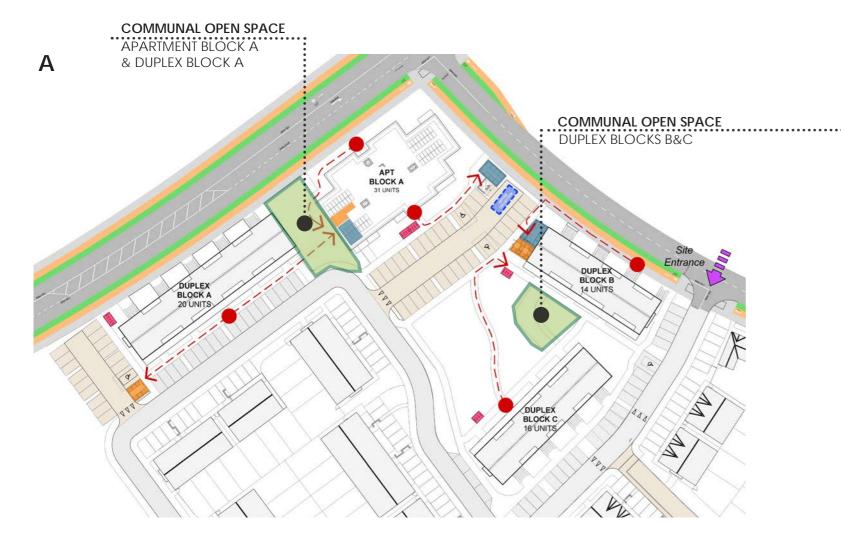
Detail of site layout Stage 2 and Stage 3) enhancement of communal areas and services provided (bins and bike stores) at the north-eastern corner, along with improvement of street layout. Source: MCORM, 2022.
